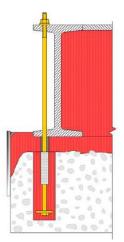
Example of canister type bolt for mounting the skid to the concrete
